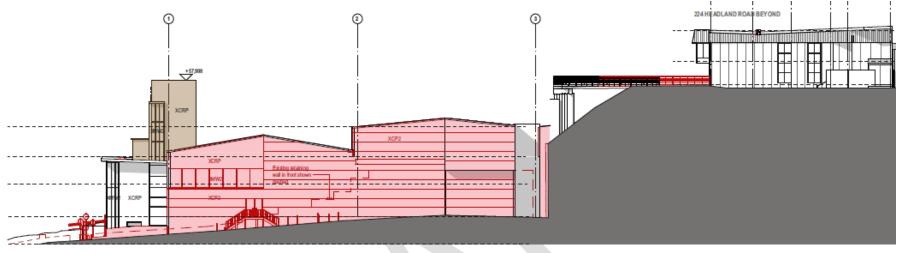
Southern elevation demolition plan (Source: TZG Architects, A-036, Revision A, October 2019)
